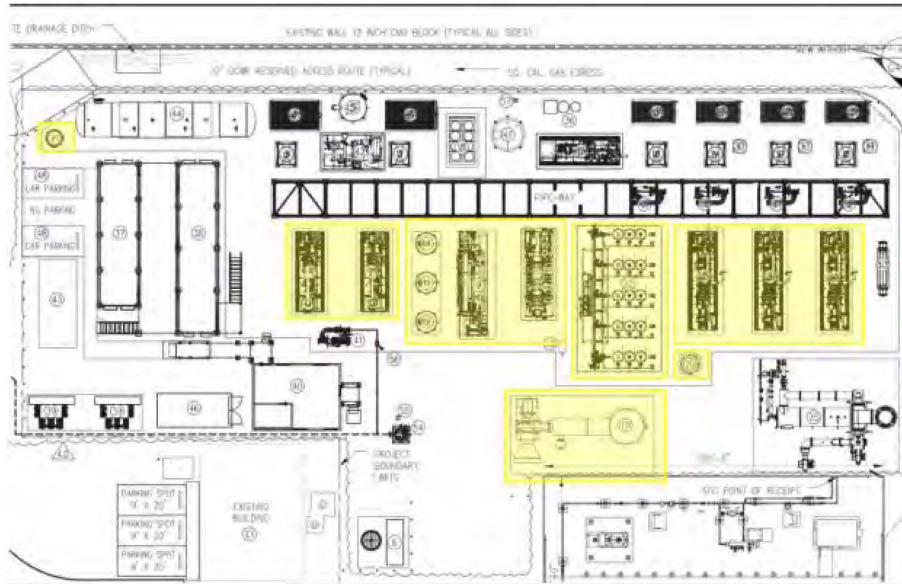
Full Scale ALGEP Conceptual Site Plan with All Equipment Listed
